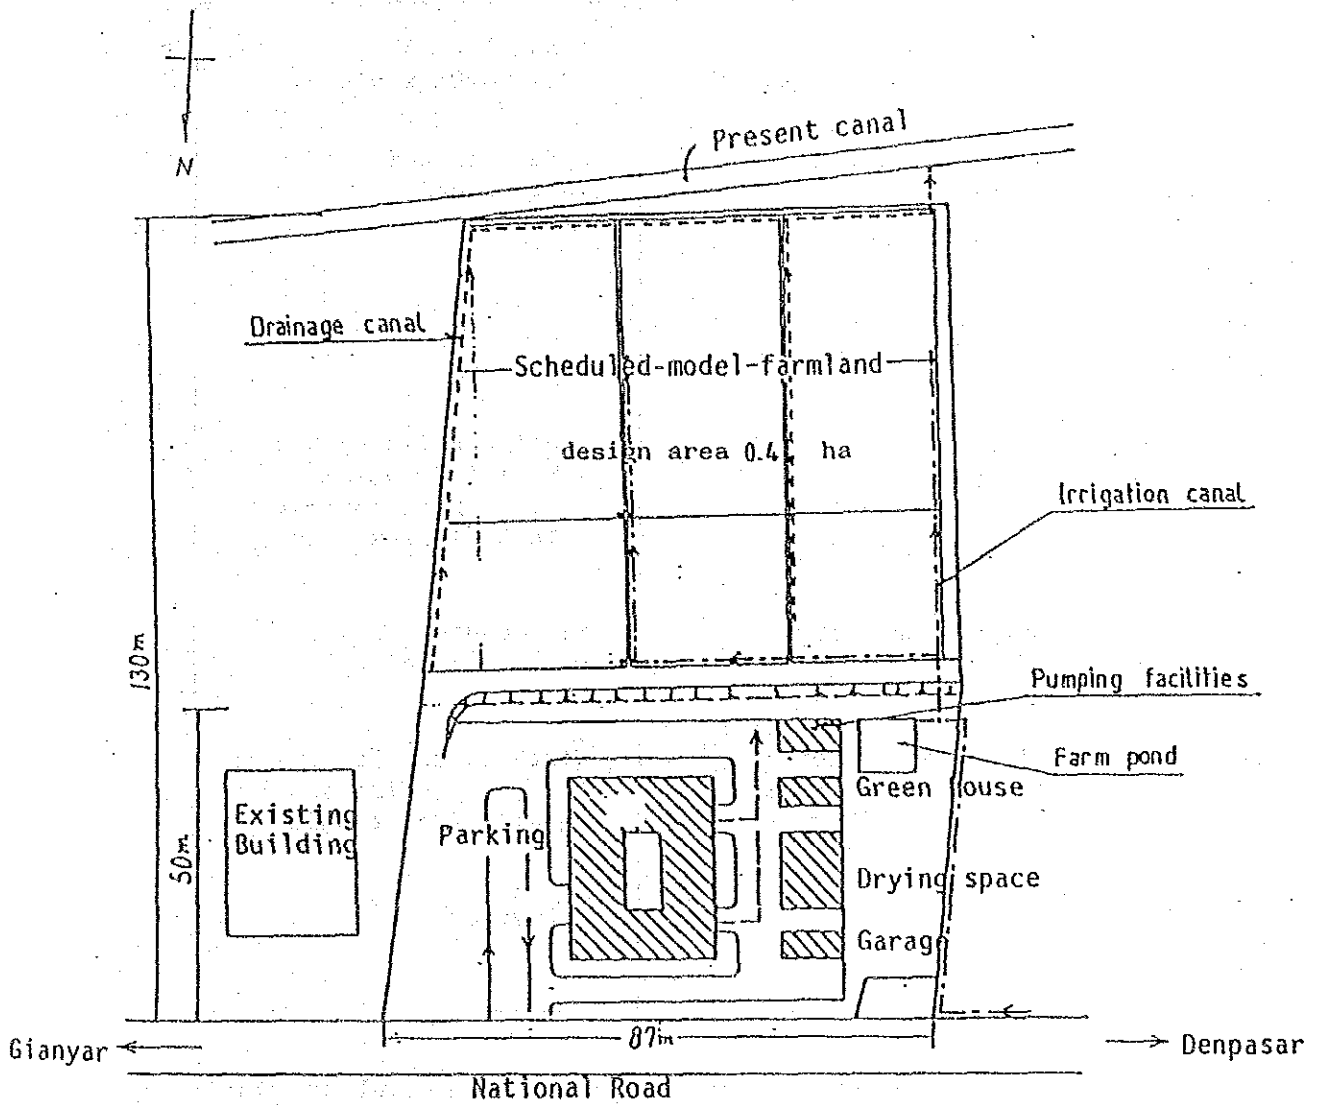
Plan of Celuk Field Laboratory (Basic plan)
